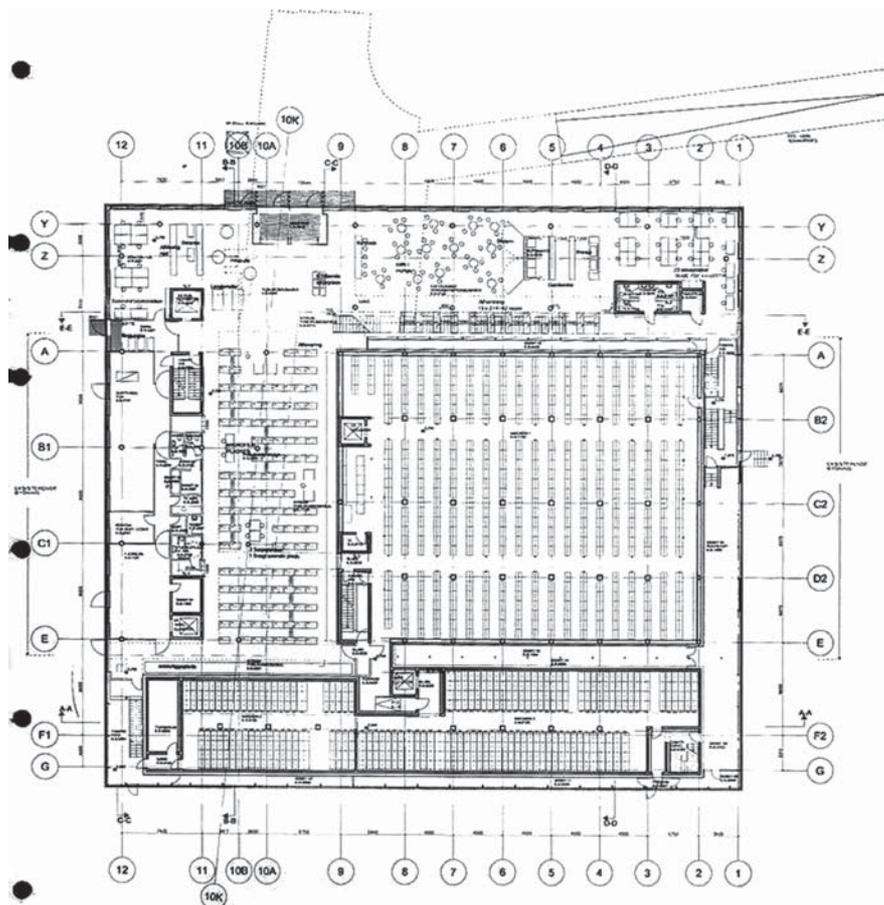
The additional building at Njalsgade will add reading rooms and extra space for storage to the existing storage (Dissing and Weitling)
